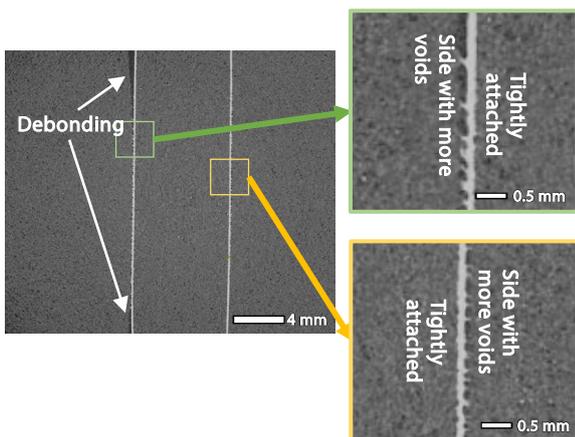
Cross-Sectional Image of Magnified Adhesive Area
